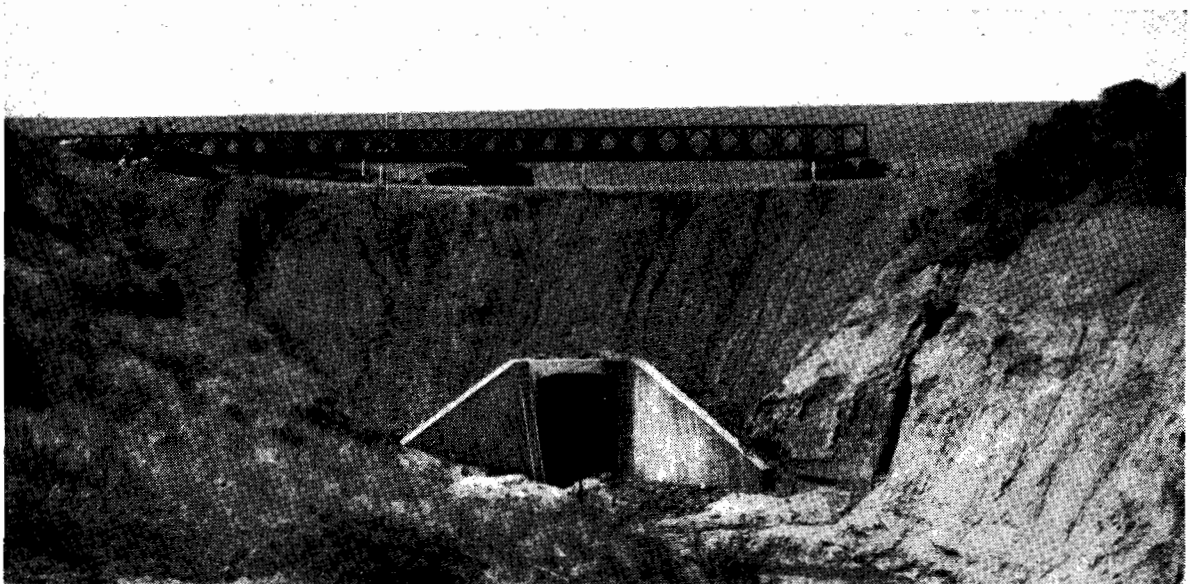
Completed culvert at Hut Gully on Ocean Road at time of dismantling of Bailey Bridge.
